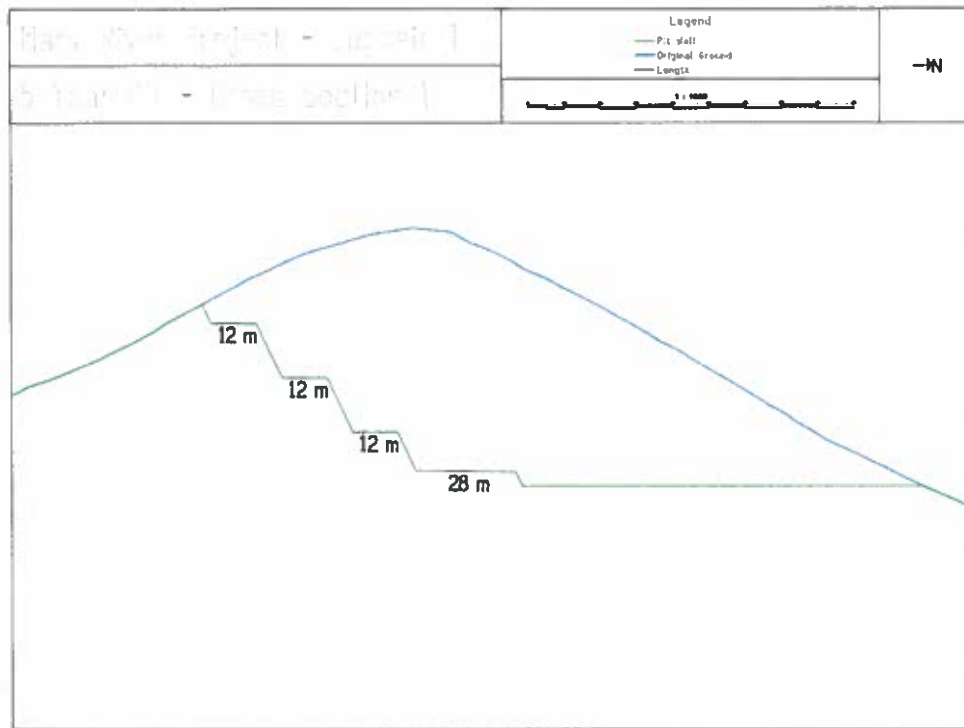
CROSS SECTION 1 ORTHOGONAL TO THE PIT WALL.
